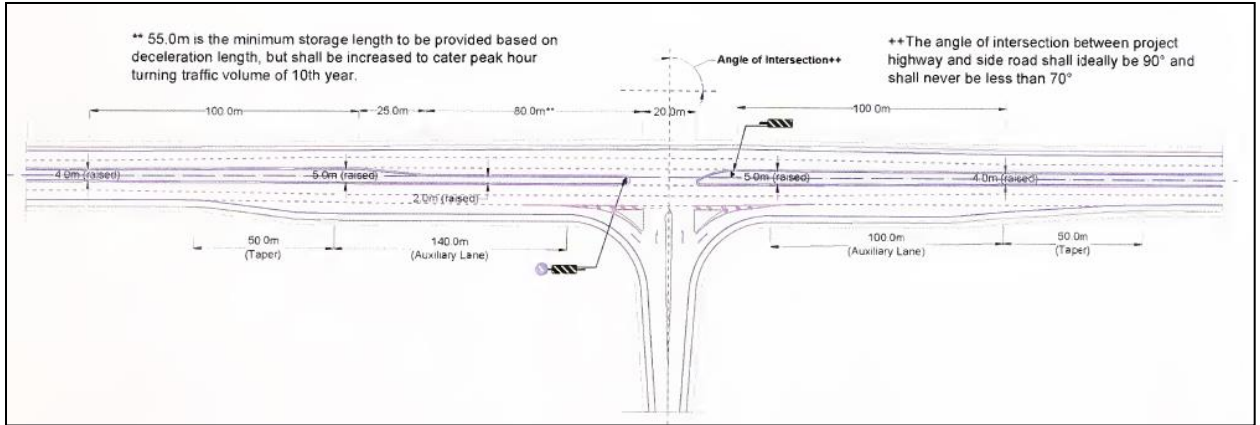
Layout for T-Intersection (with Right Turn Protected Arrangement)
